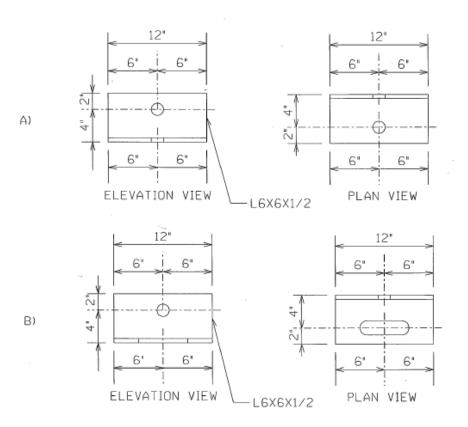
Oseligee Creek Bridge Abutment Connection (Expansion)
